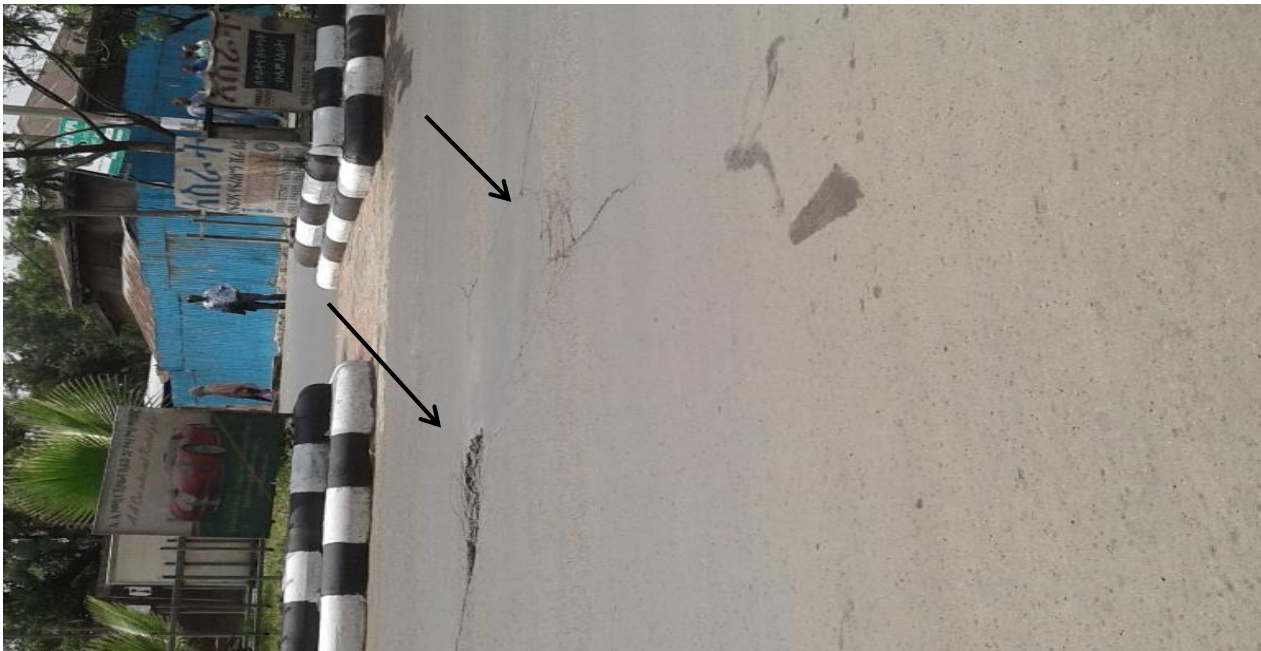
Photo. Pavement crack and blocked roadside drainage inlet
